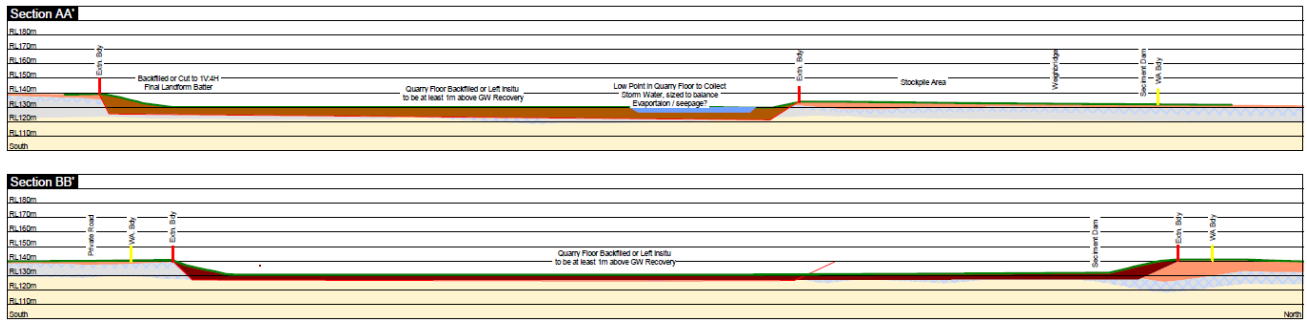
Schematic of cross sections AA' and BB', showing groundwater and stormwater considerations (BCA, 2024).
